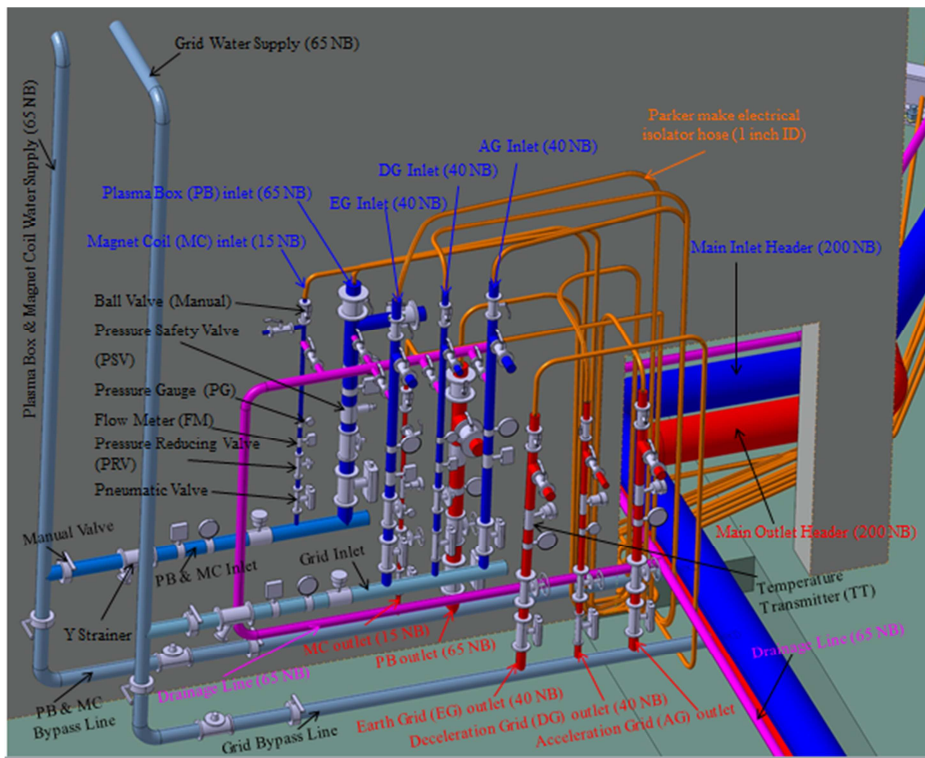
Three dimensional view of piping layout for PINI ion source water cooling system
